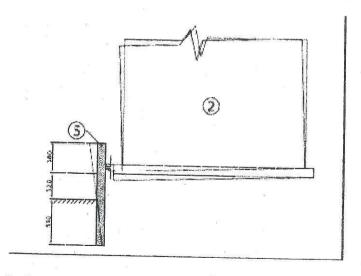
Plan situation of buildings and concrete walls 4 and 5
